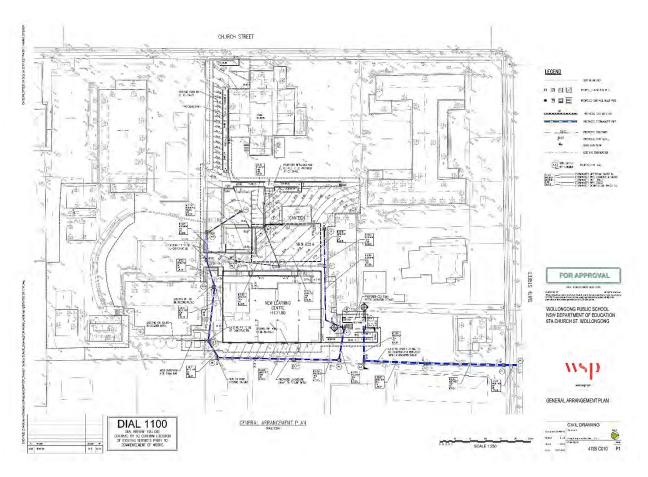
Proposed Stormwater Arrangement. NTS. (WSP 2017)
